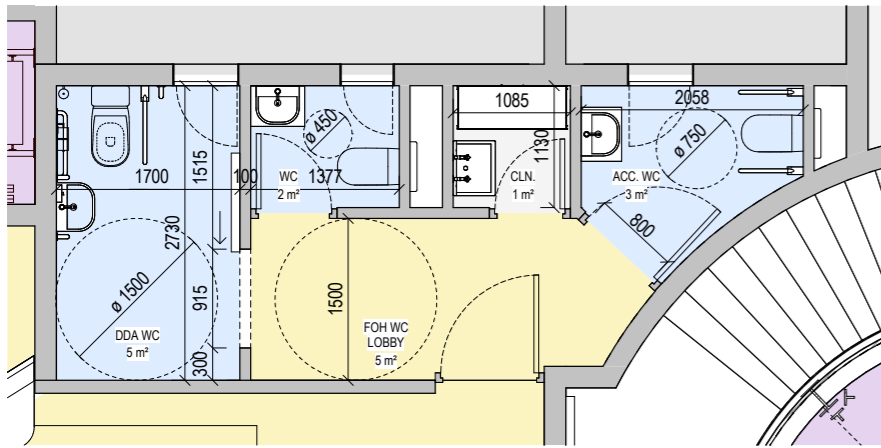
39-40 Furnival Street - Ground Floor Toilets
